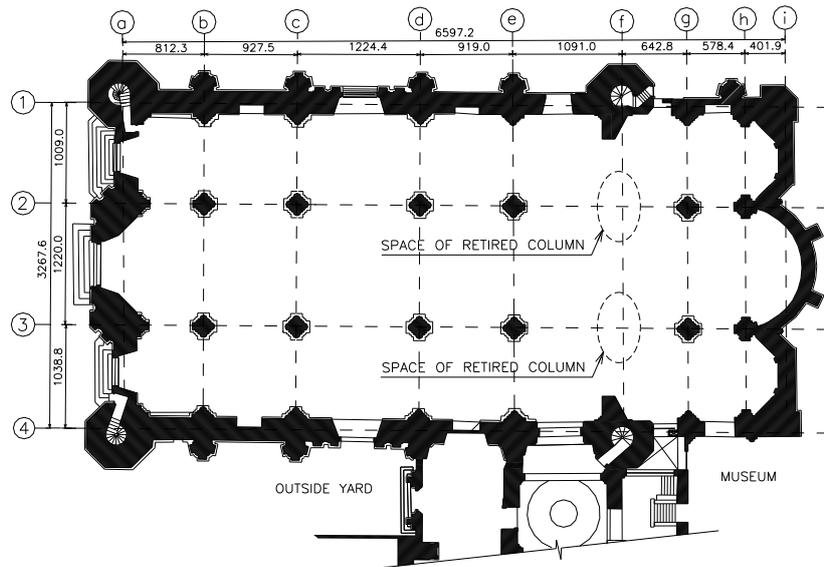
Plan of the Ancient Basílica de Guadalupe after retirement of two columns in 1930.
